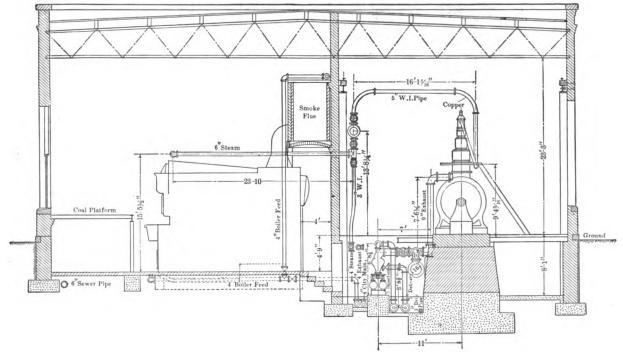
ELEVATION OF PIPING FOR POWER HOUSE, ENGLEWOOD & CHICAGO STREET RAILWAY CO.
